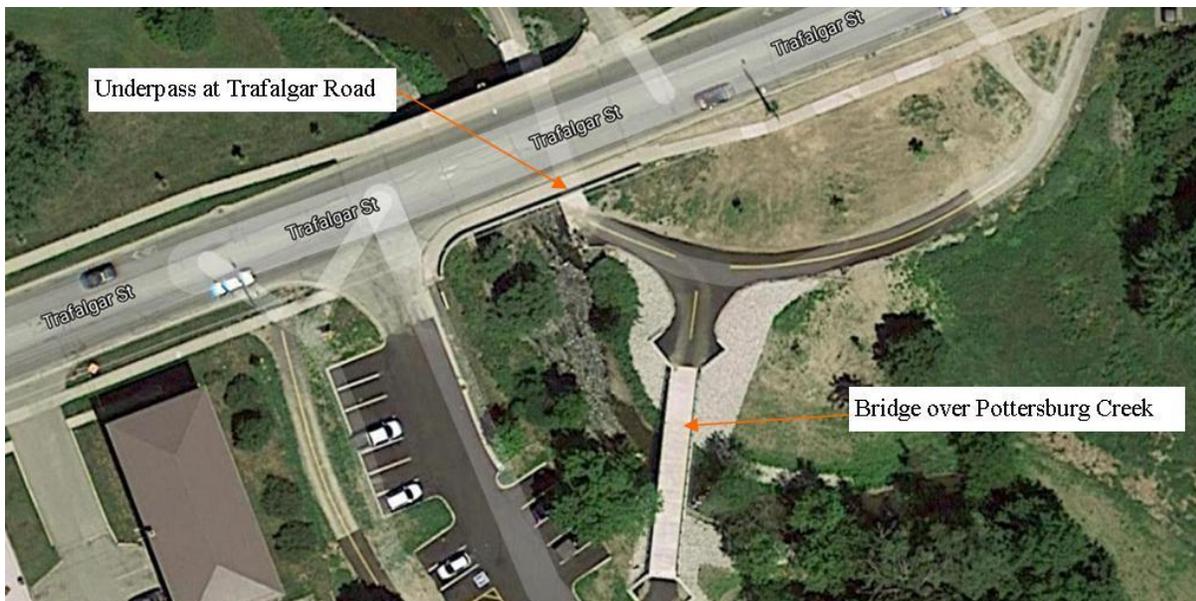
Close-up view of the Pottersburg Creek bridge and the Trafalgar Road underpass.
